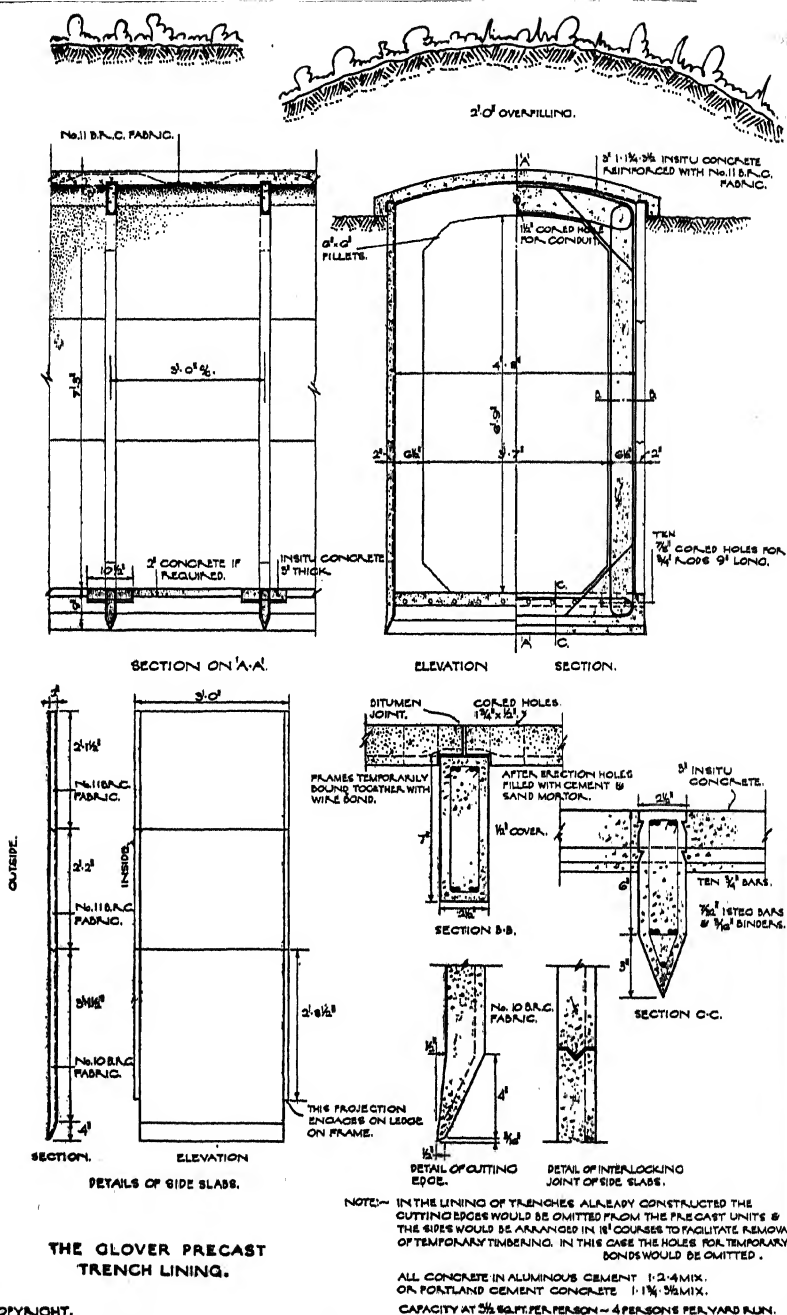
Constructional detail of the Glover rigid frame trench lining system.
